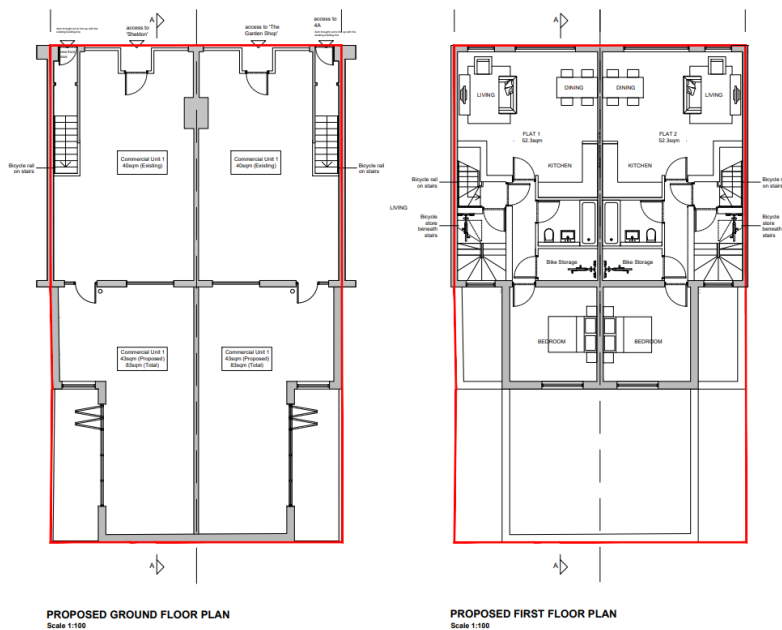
Proposed Ground Floor Plan 19/3704/FUL
